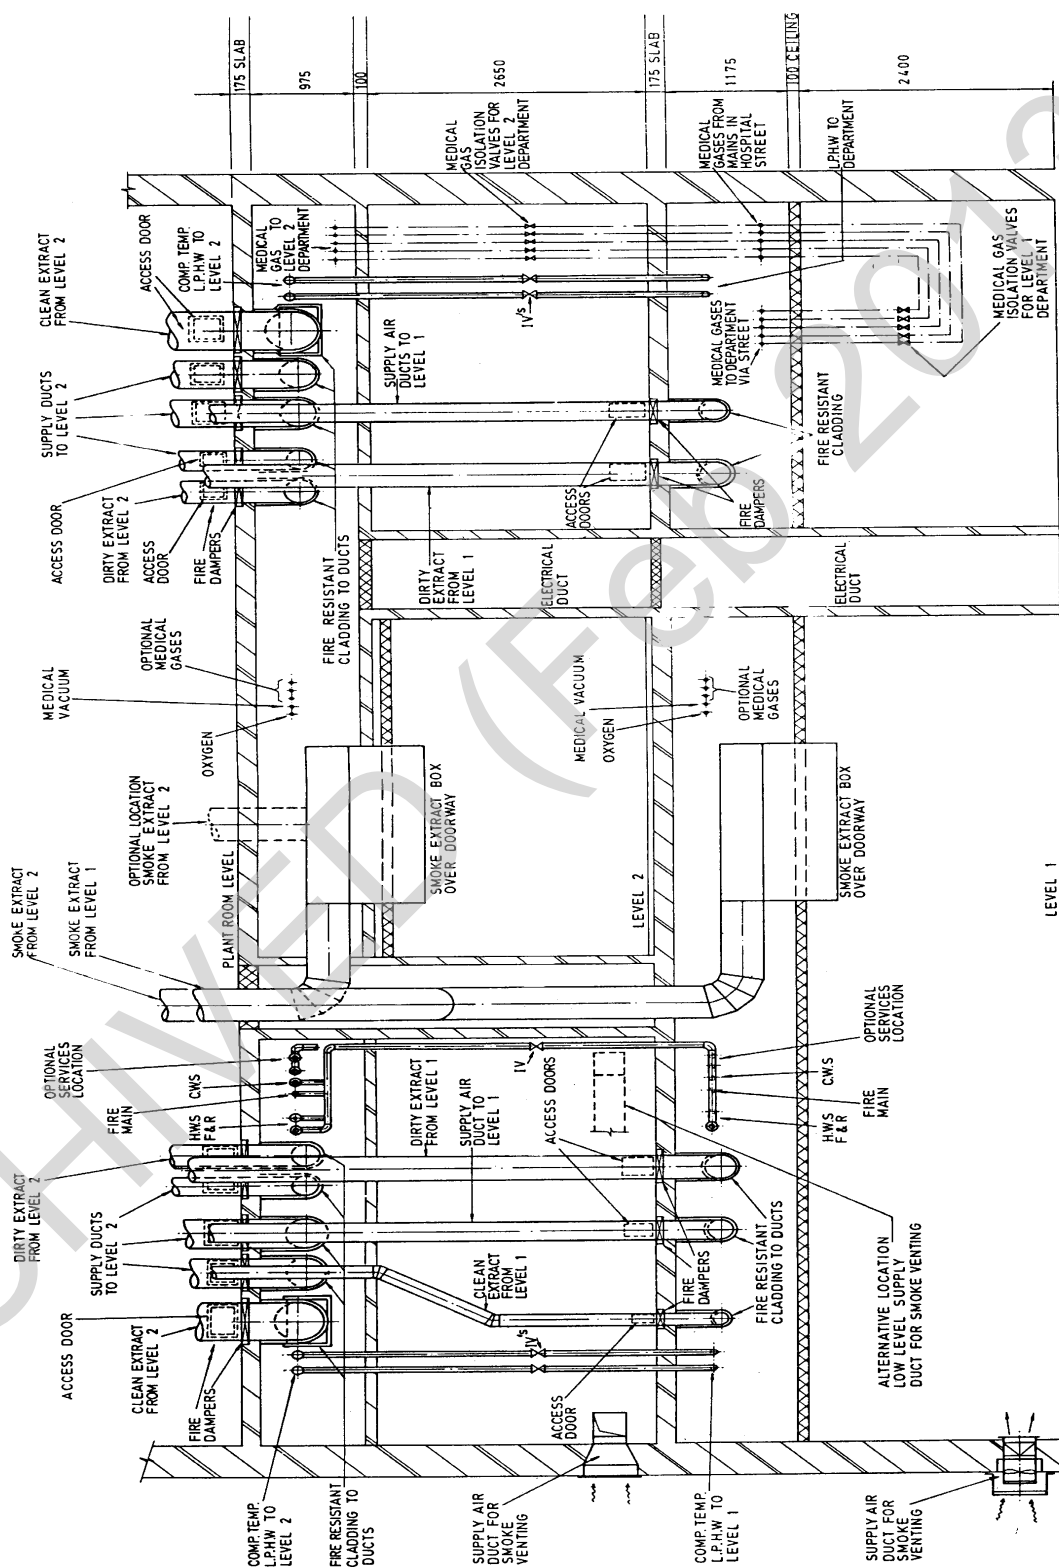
Typical sectional elevation through a multi-storey department showing suggested minimum service zones
